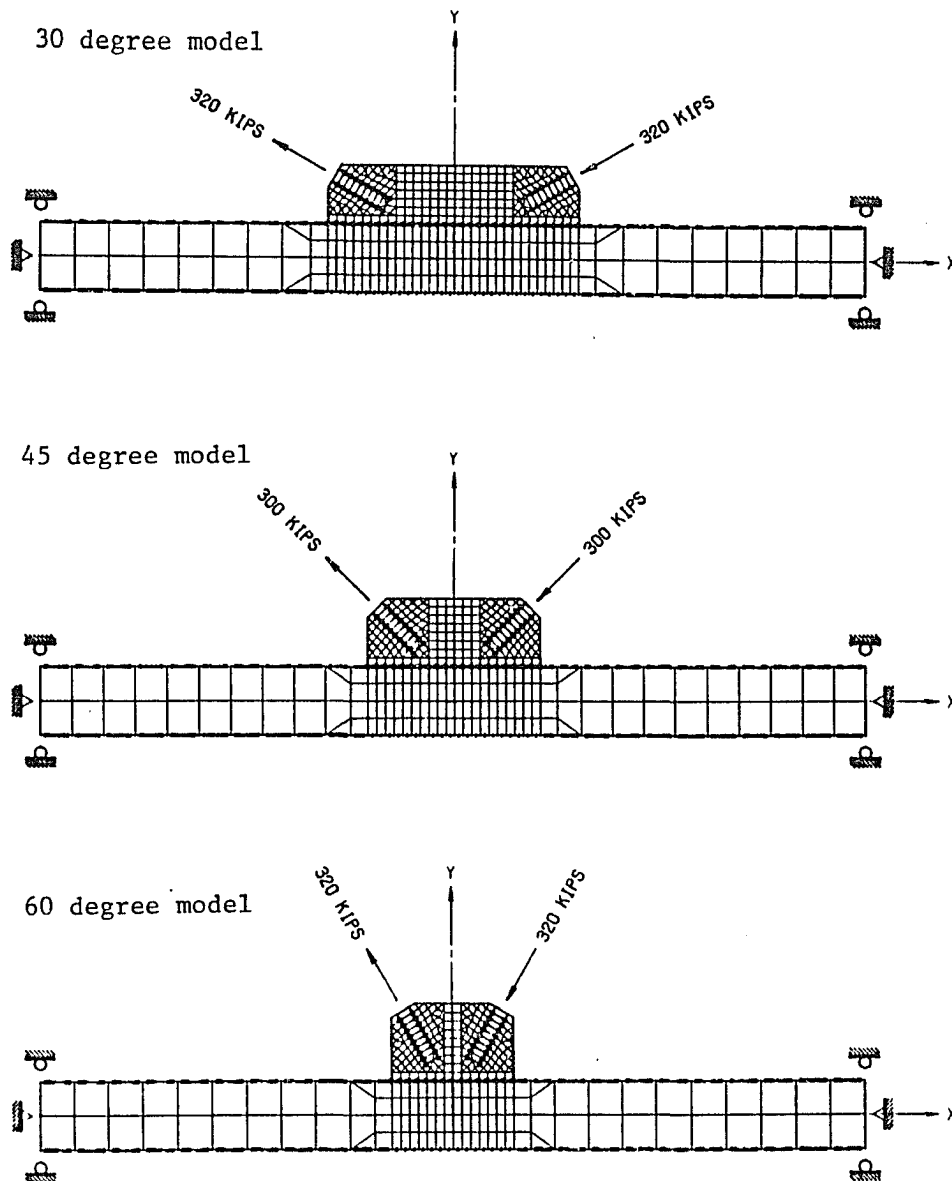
K-bracing Connection Models Utilizing Working Point Number 2.
